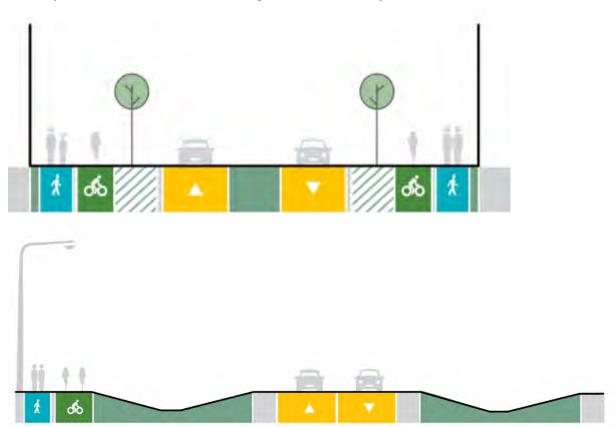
Coatesville-Riverhead Highway Cross Section – urban and rural section
